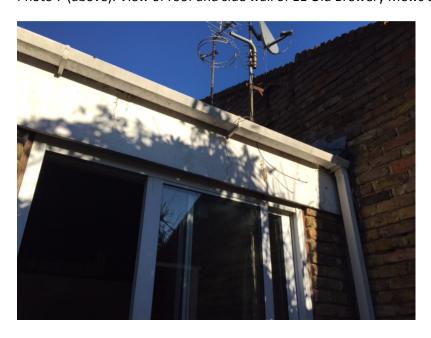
(above): View of roof and side wall of 9 Old Brewery Mews as viewed from existing terrace
